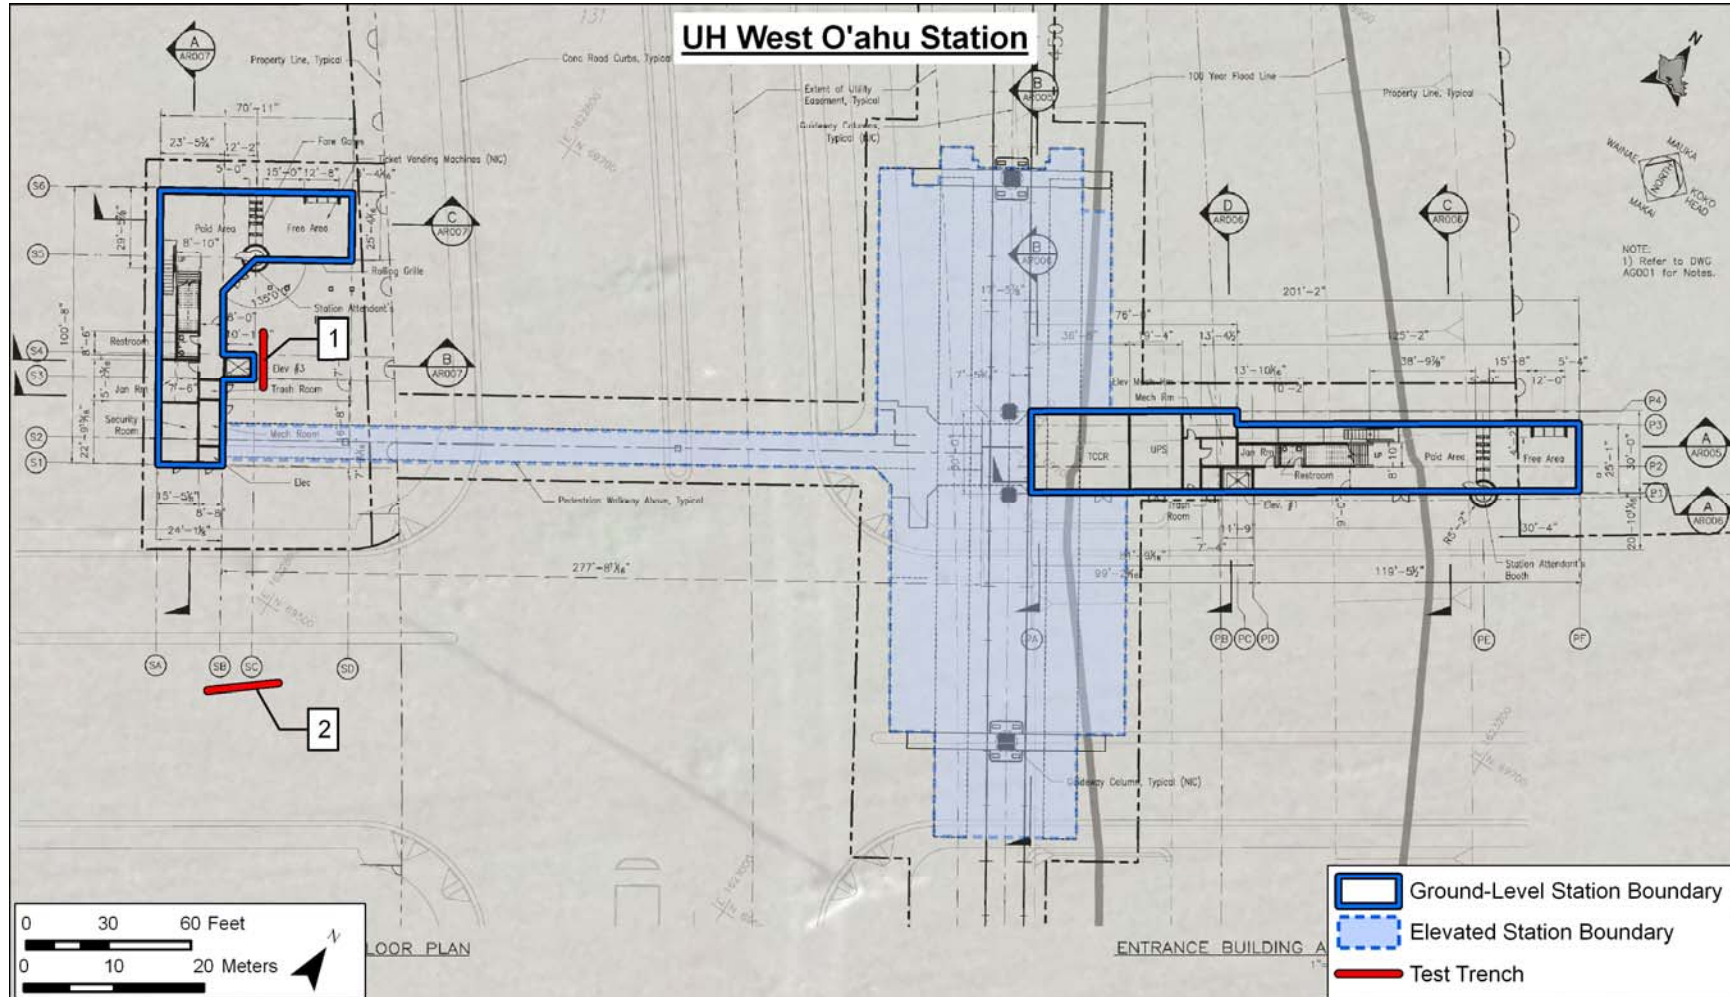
Floor Plan of UH West O'ahu Station showing location of test trenches
